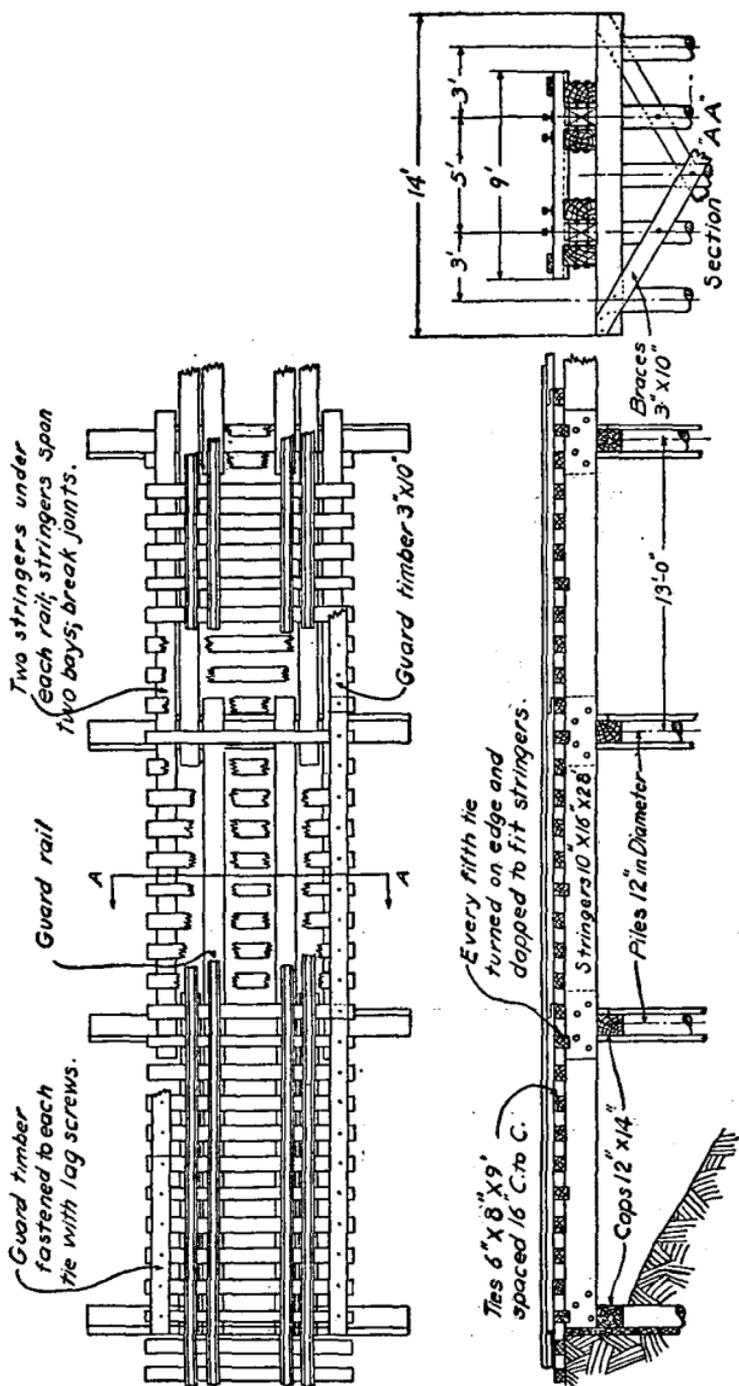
Floor system for standard gauge railway timber or pile trestle
